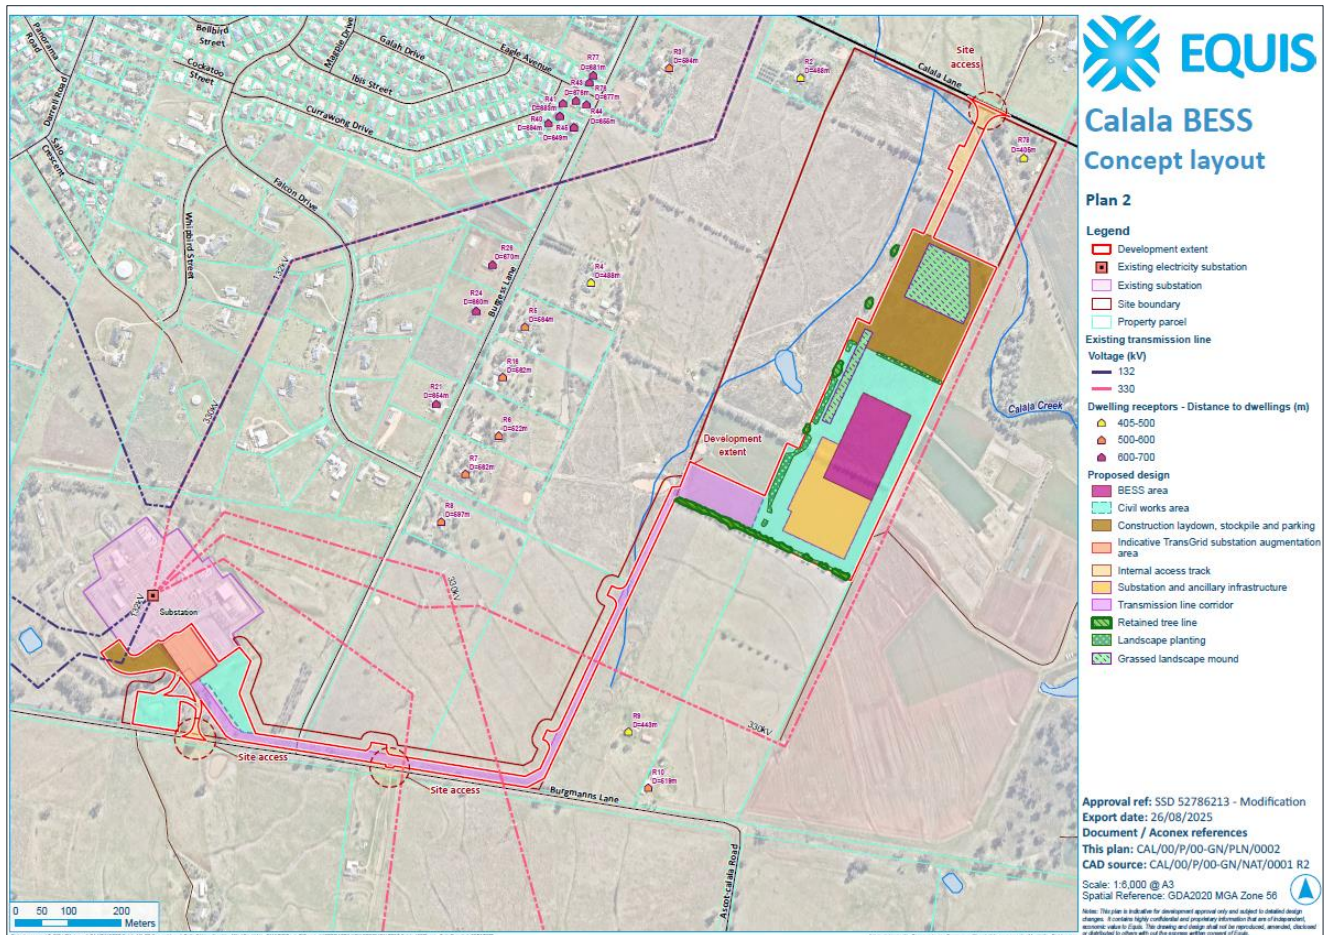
Concept Layout Plan R2 (Source: Equis, 2025)
